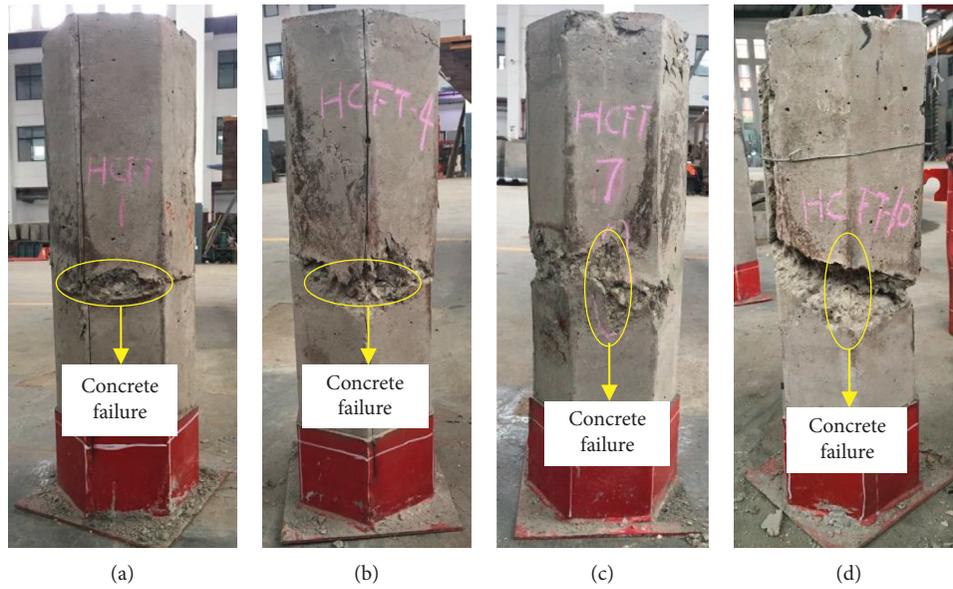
Core-concrete damage of typical specimens. (a) Horizontal slotting in the sideways. (b) Horizontal slotting in the corner. (c) Vertical slotting in the sideways. (d) Vertical slotting in the corner.
